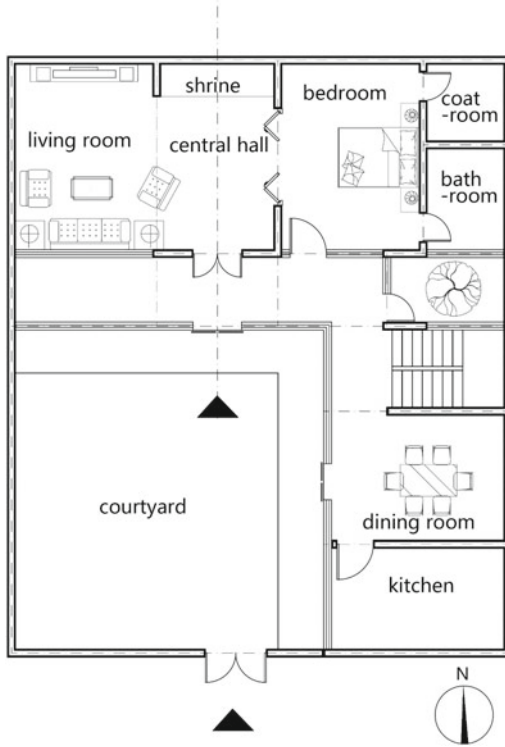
The plan of our design incorporating spatial model of traditional “three-room” layout (drawn by author in 2022)
